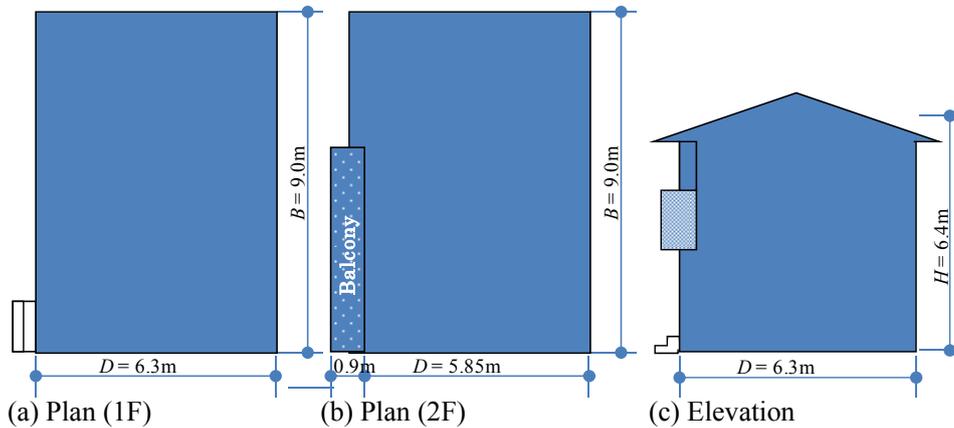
Outline of overturned 2-story hip roof wooden house (Tamura et al., 2012)
